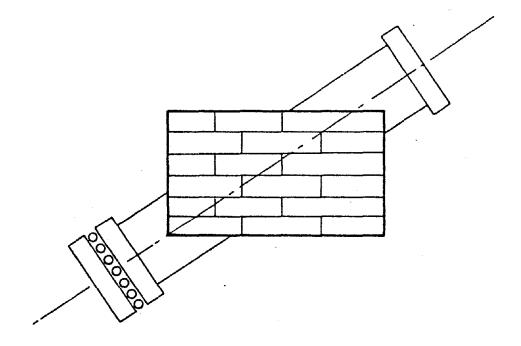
TYPE OF TEST SPECIMENS USED BY YORULMAZ AND SOZEN, 1967
